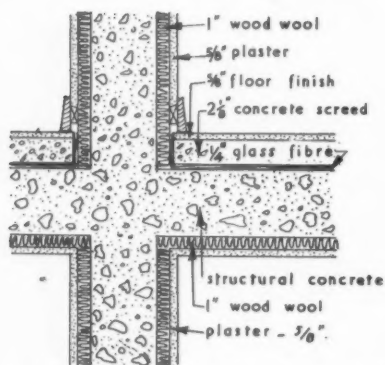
Detail showing wood wool slabs used as permanent shuttering and sound insulation in the block with concrete box frame.
